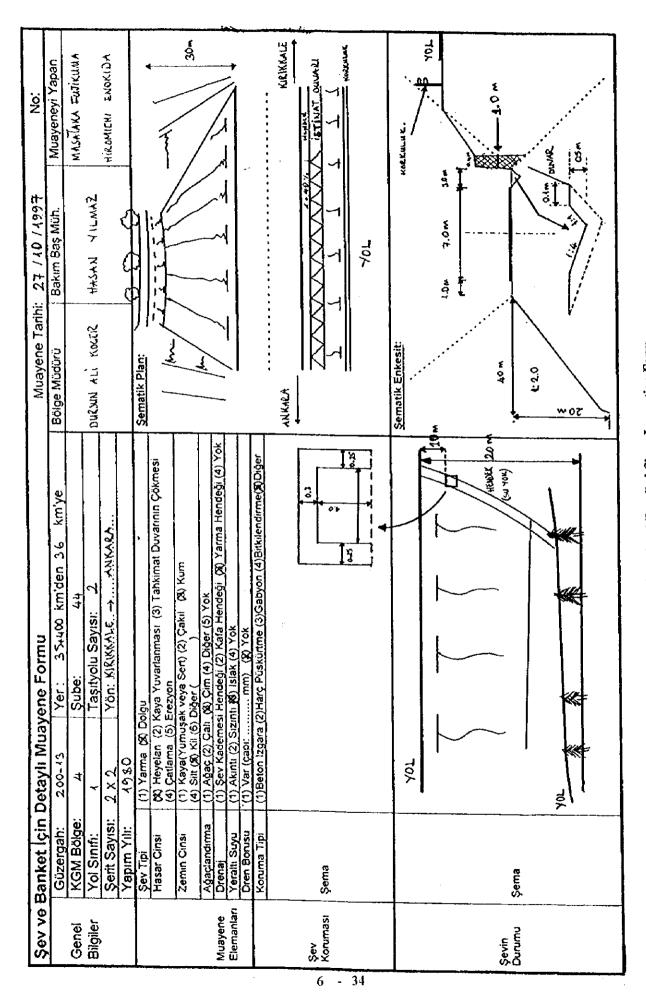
Example of Completed Detailed Slope Inspection Form
